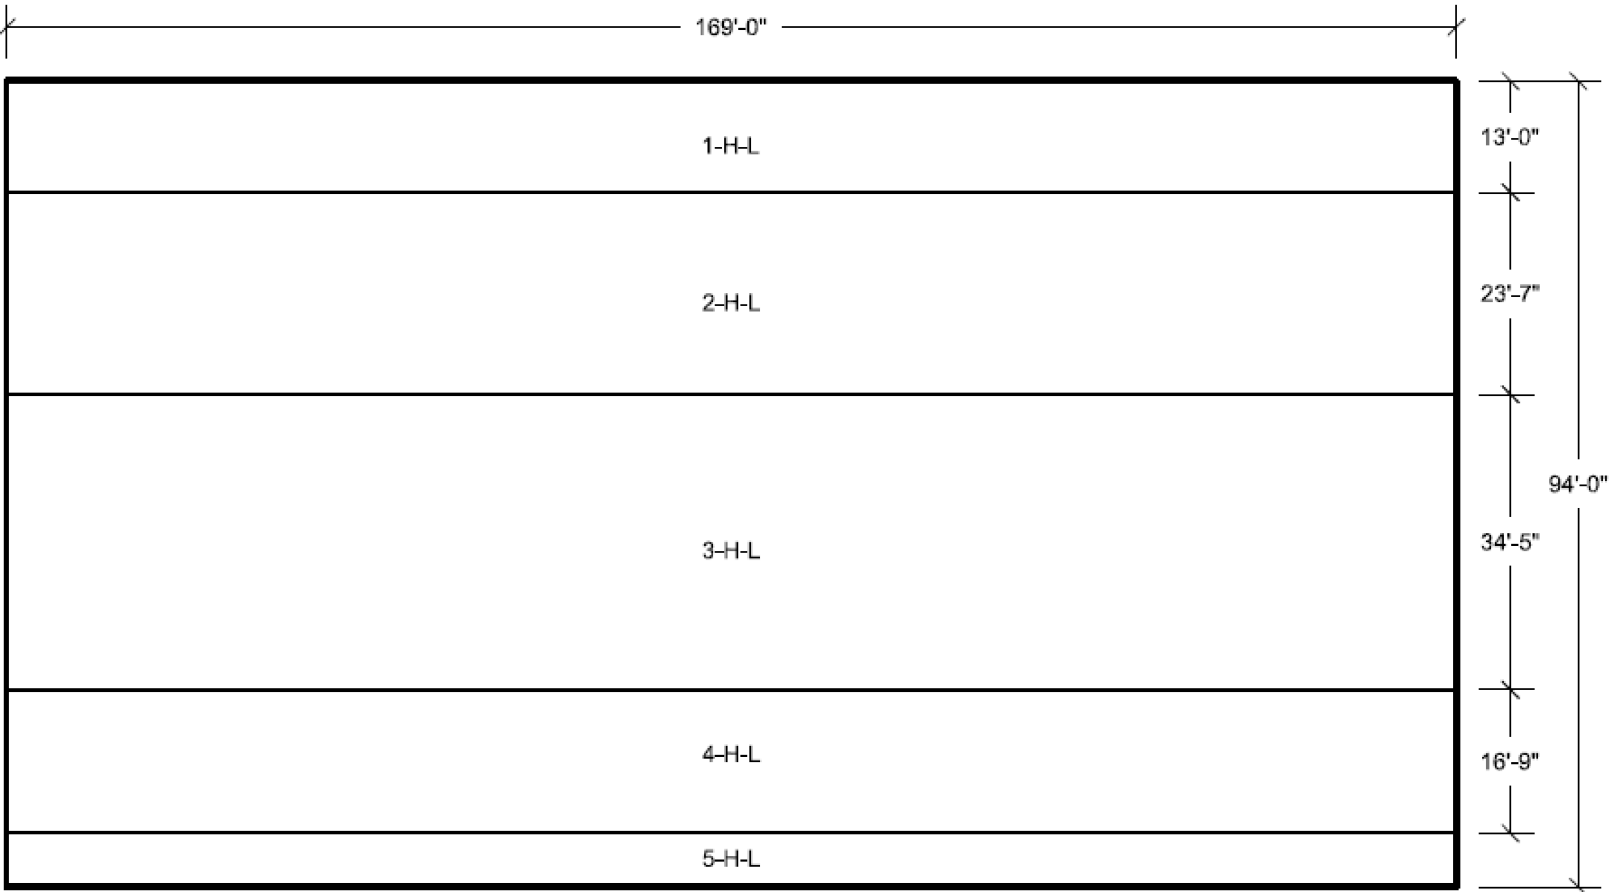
H.6-125 Pump House Foundation Mat East/West Reinforcement Zones Bottom Face
